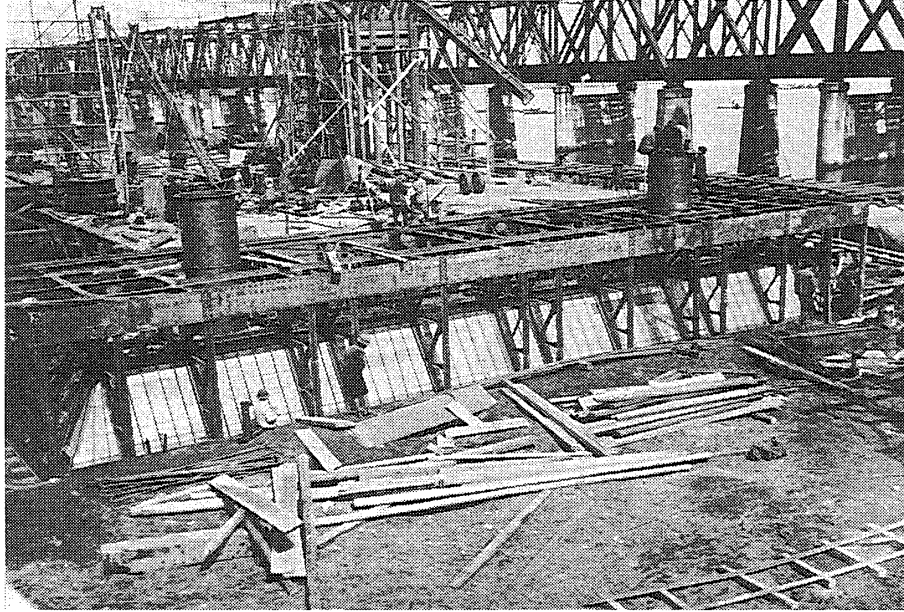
・1 Workmanship of Forms and Placing of Reinforcement of Working Chamber (Jyuso Highway Bridge)
